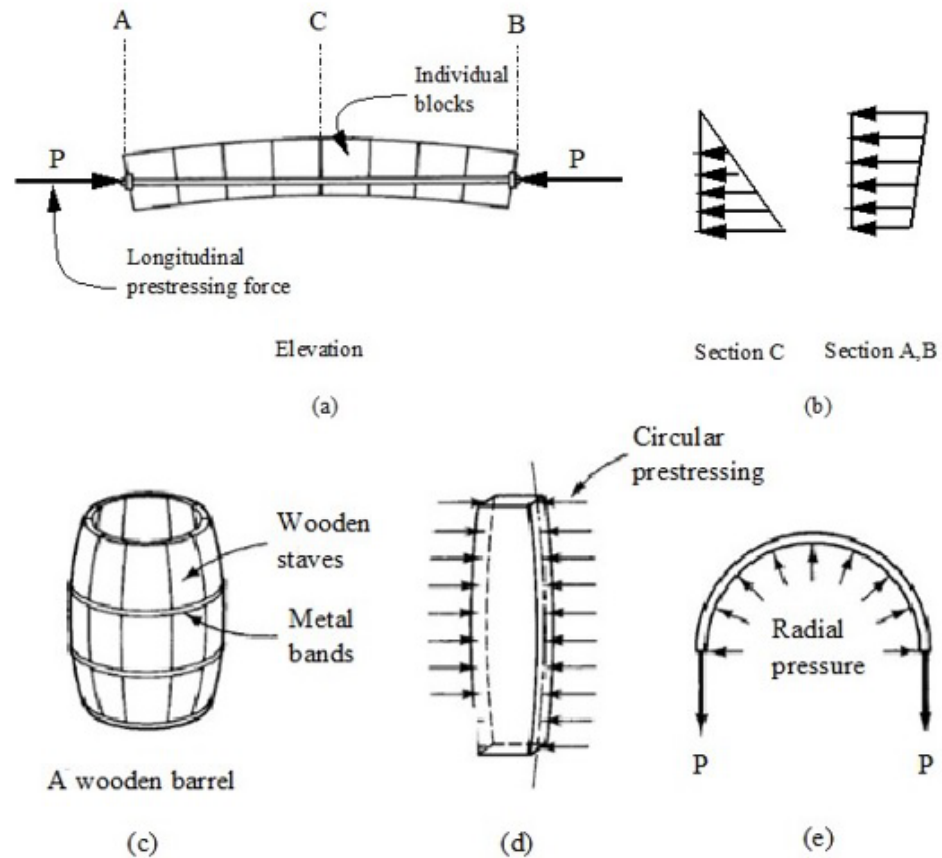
Concept of prestressing with wooden barrel and slaves.
